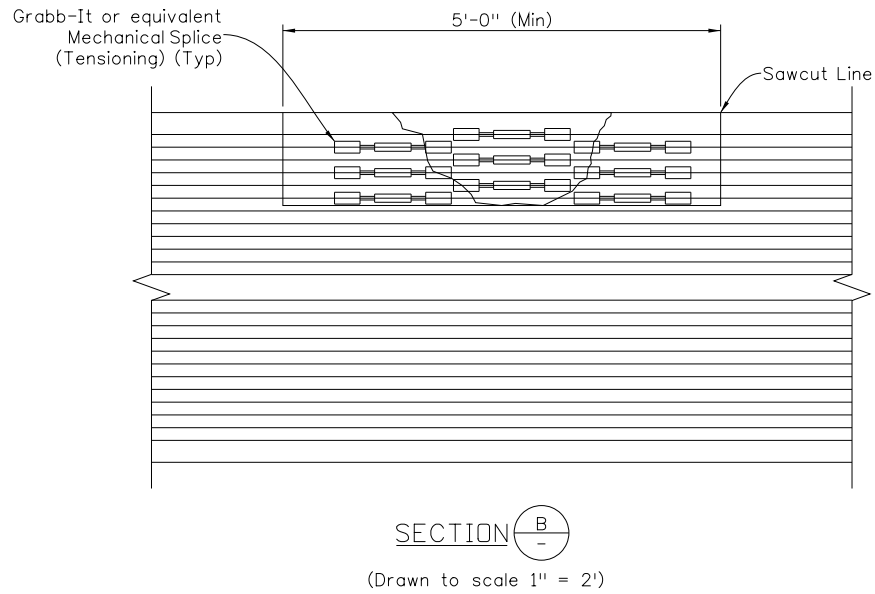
(E)-3 Sample Section of Precast Prestressing Repair
